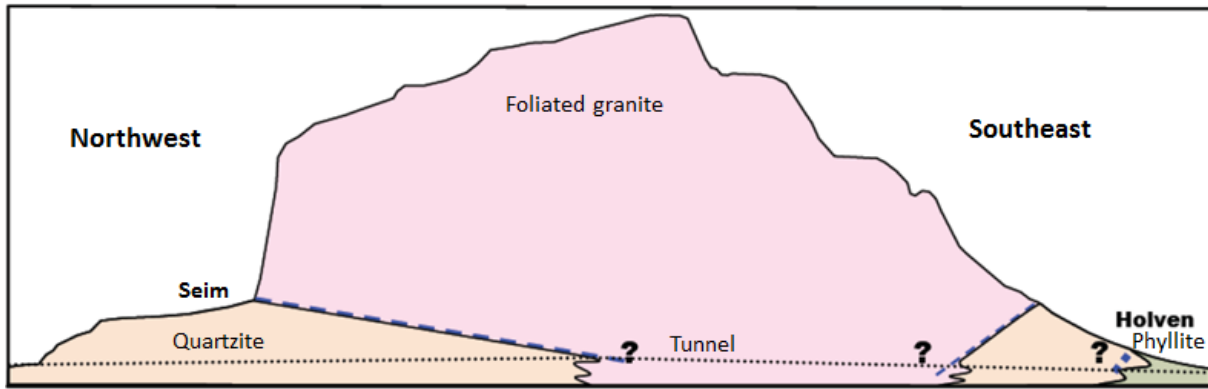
Longitudinal profile of Joberget tunnel with possible rock boundaries (NPRA, 2013a).
